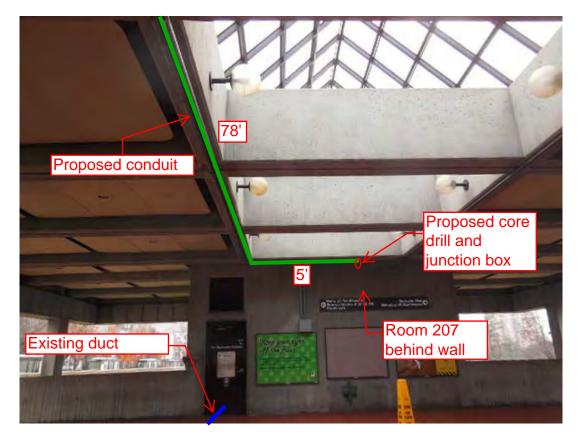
Existing and proposed conduits to AFC Panel in AC Switchboard Room 107
